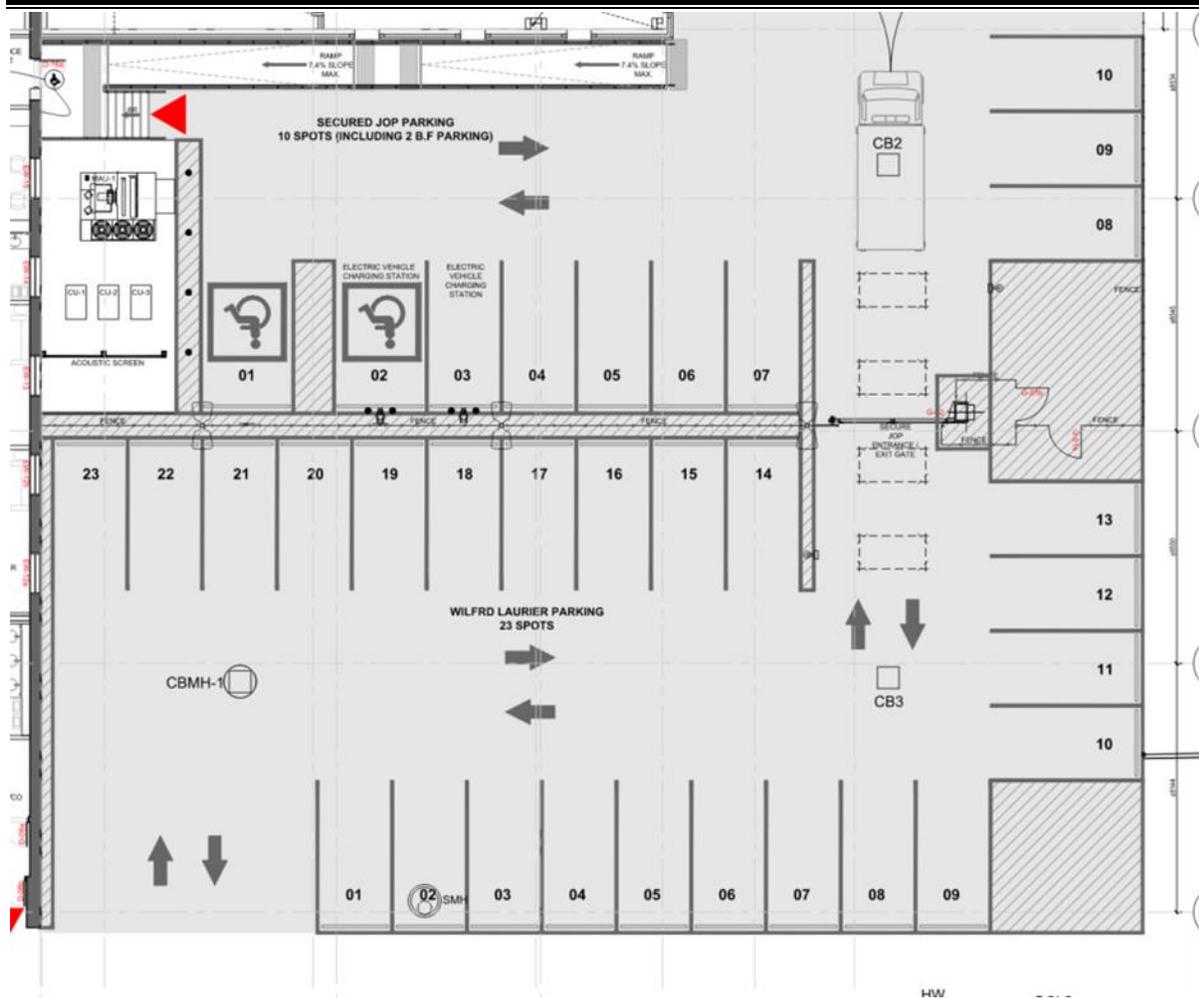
below shows the location of barrier-free parking locations for POA staff in the parking lot and the barrier-free entrance with ramp to the facility. There are also barrier-free parking spaces located on Colborne Street in front of the main barrier-free entrance for the public to use.
